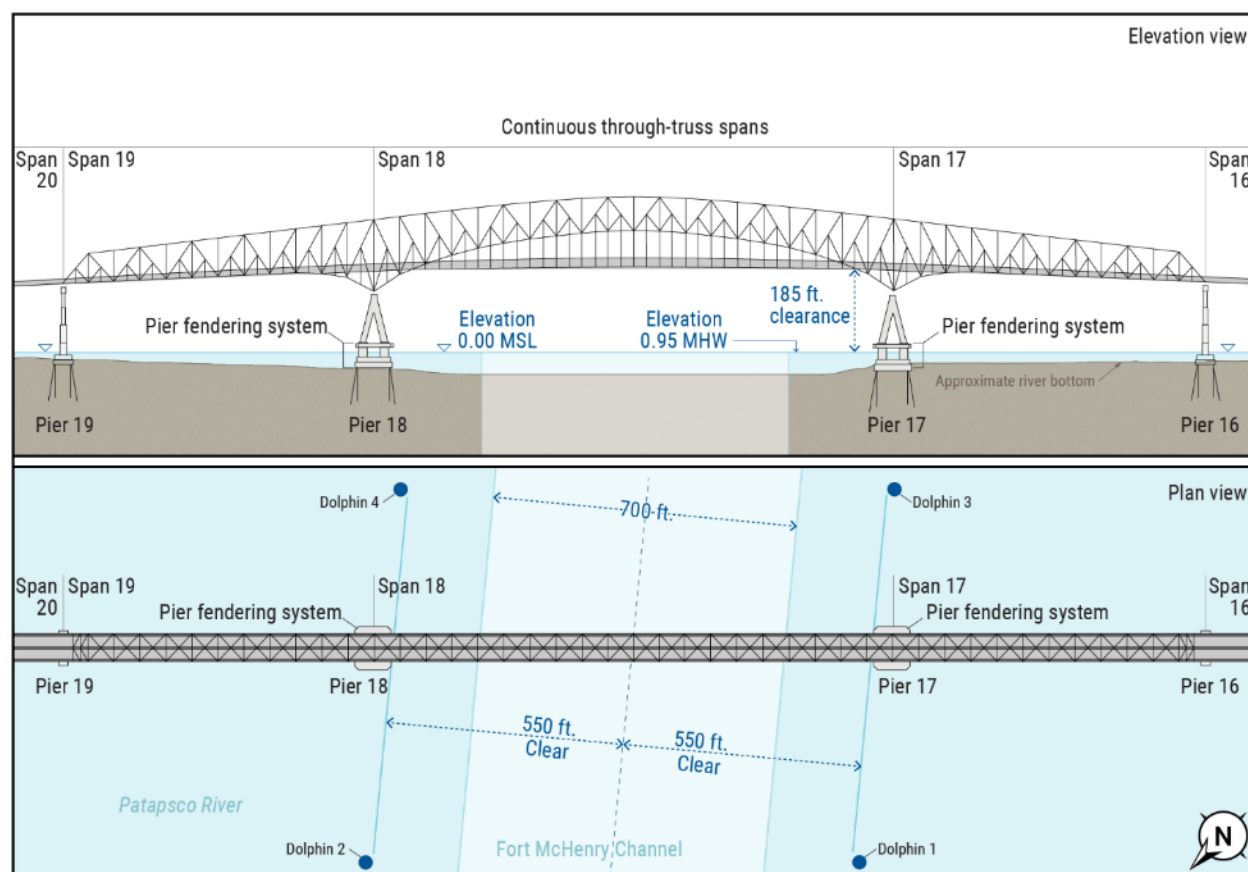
From top: Elevation view (from north looking south toward bridge) and plan view of the main spans of the Key Bridge over Fort McHenry Channel.
